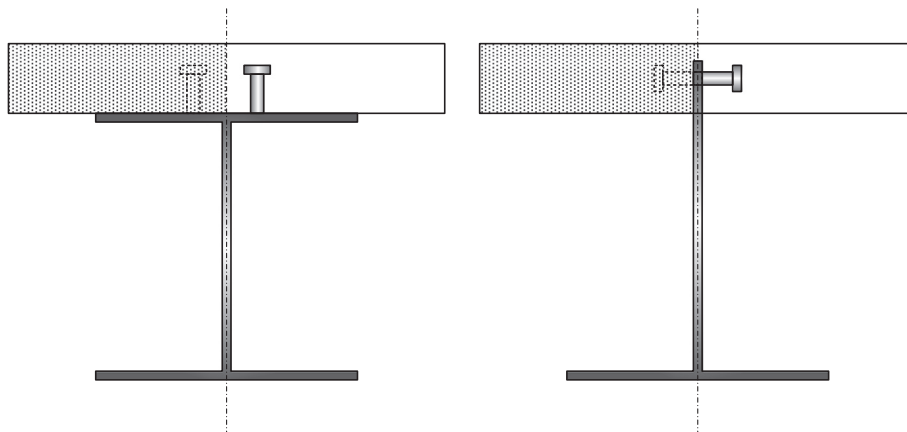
Cross-sectional configuration of conventional composite beam (left) and composite beam with inverted-T shaped girder (right).
